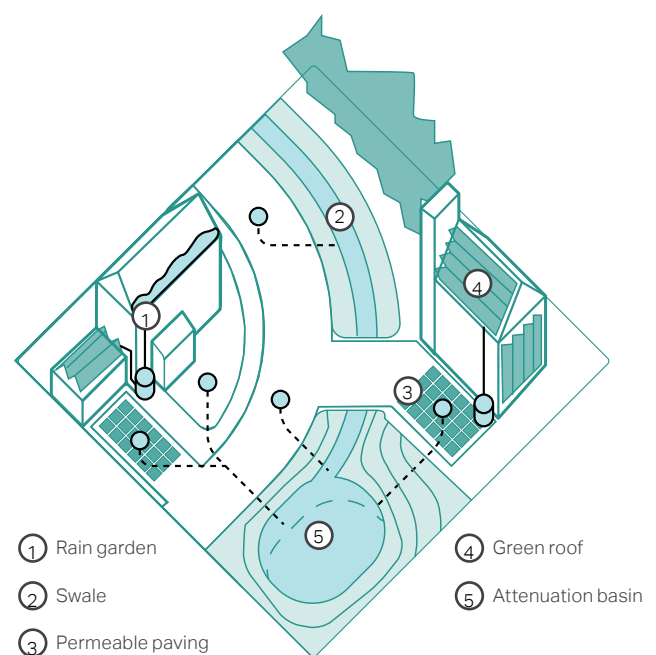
Diagram showing the best use of harvesting water systems rain garden, swales, permeable paving, green roofs
